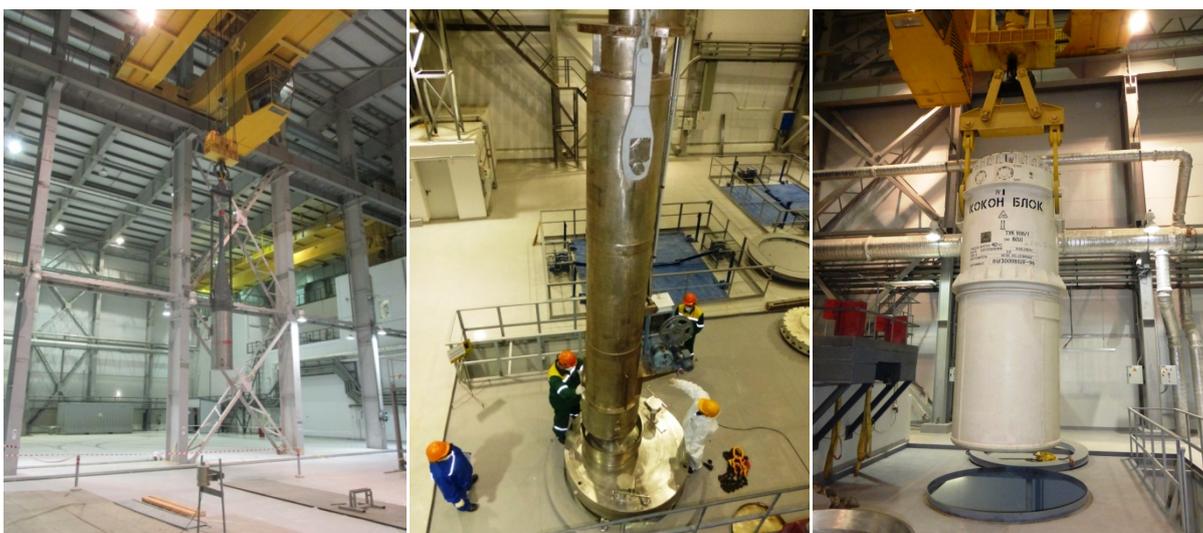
Process operations performed in the handling hall and TUK loading station in Building 153.
